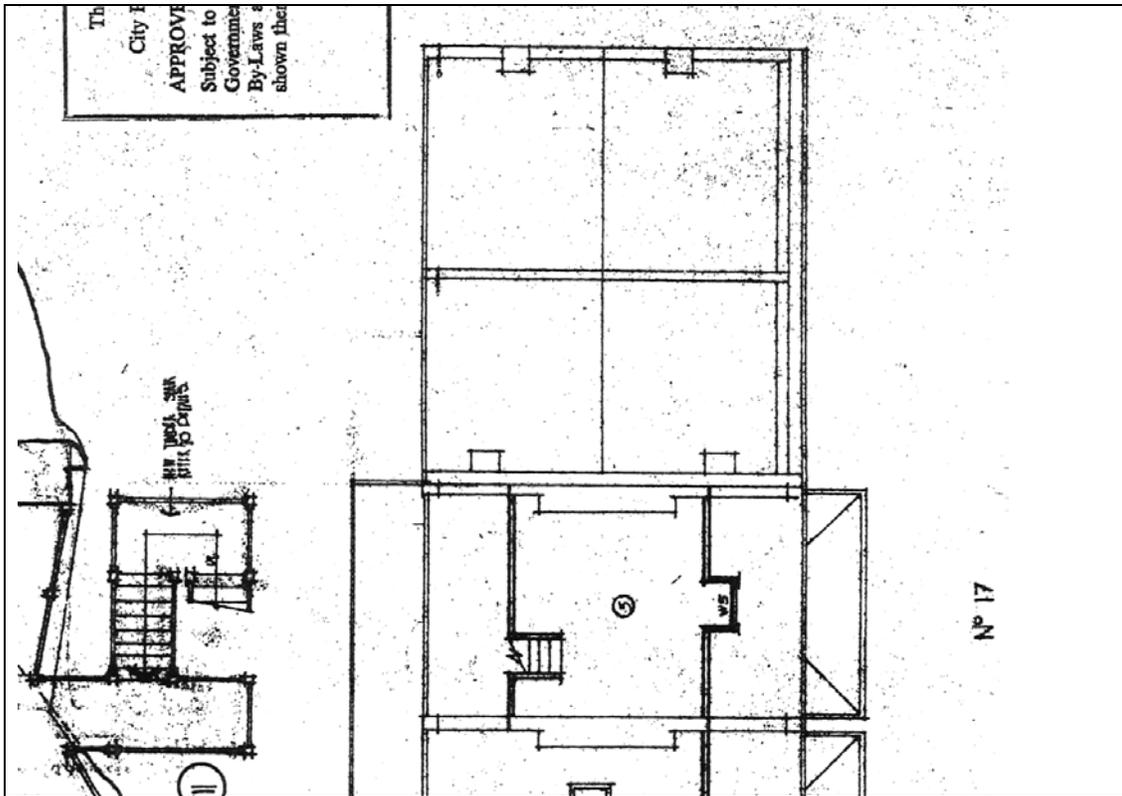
Roof plan prepared by Fisher Jackson Hudson Architects. (Source: City Archives 1383/71)
